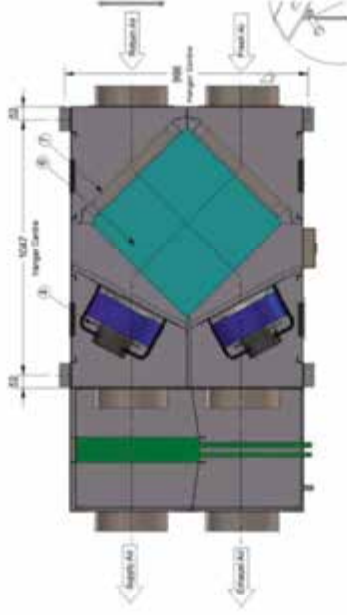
Typical showers/change rooms in ceiling ERV with heating hot water coil.
